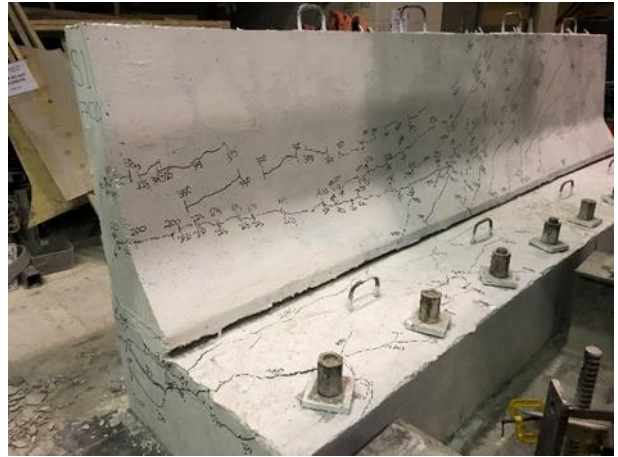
Wall flexural cracks in specimen S1-FRC10
